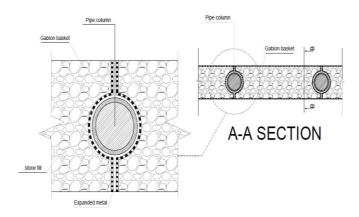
The first proposal (Section A-A) Source: Designed and drawn by the author
